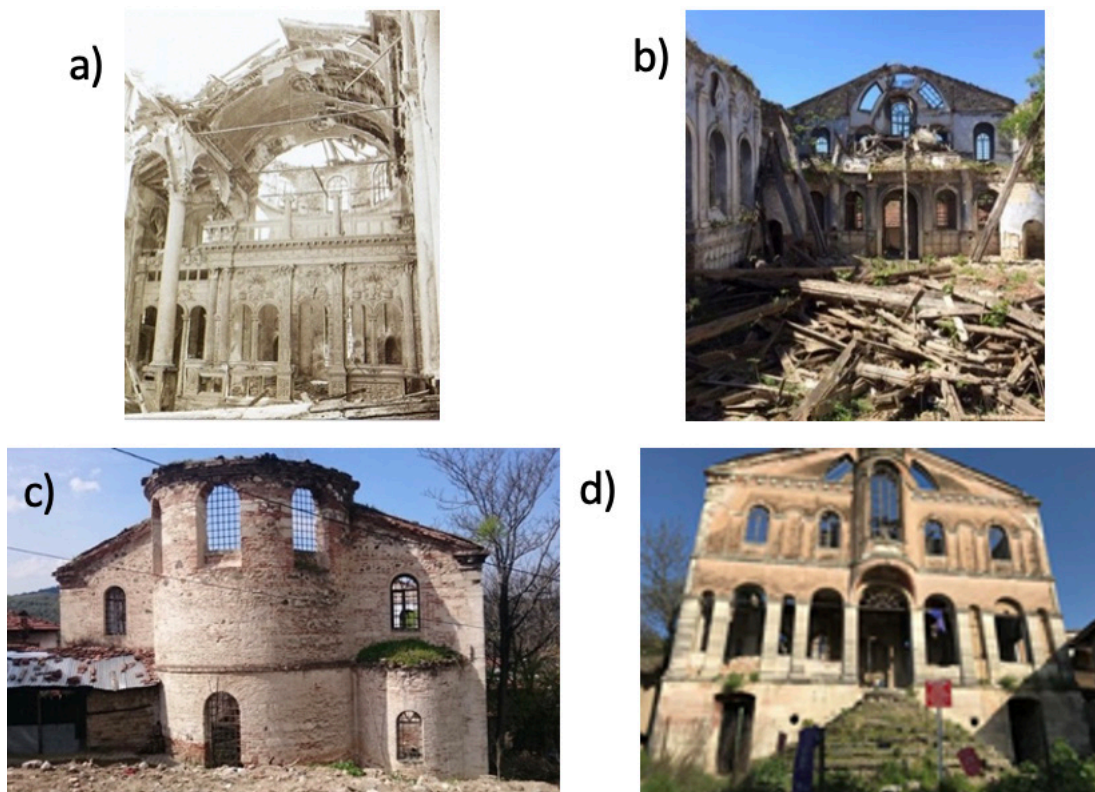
Derekoy Church a) View from naos towards bema [20], b) East façade, c) View from naos towards narthex and d) West façade
